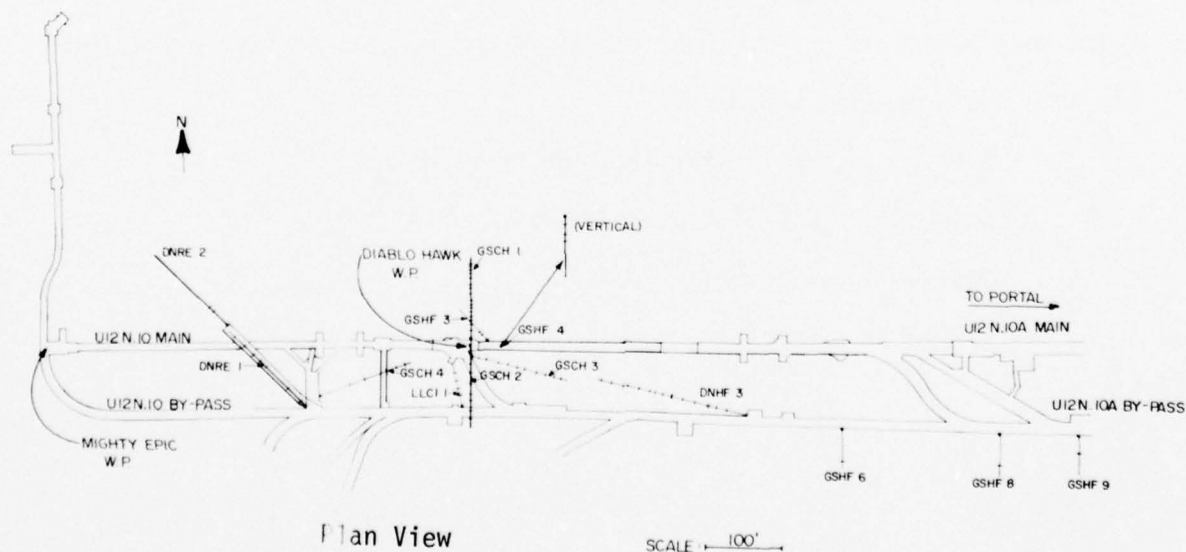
Location of drill holes in Diablo Hawk area. (Small cross marks note the location from which core samples were received and tested)
